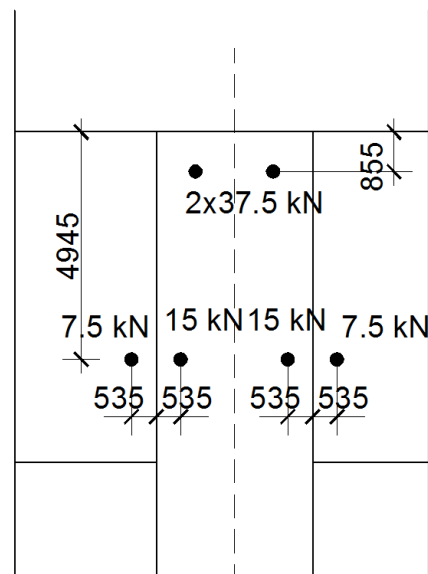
Loading from the caissons-3D view (source: Drever calculation sheets)
